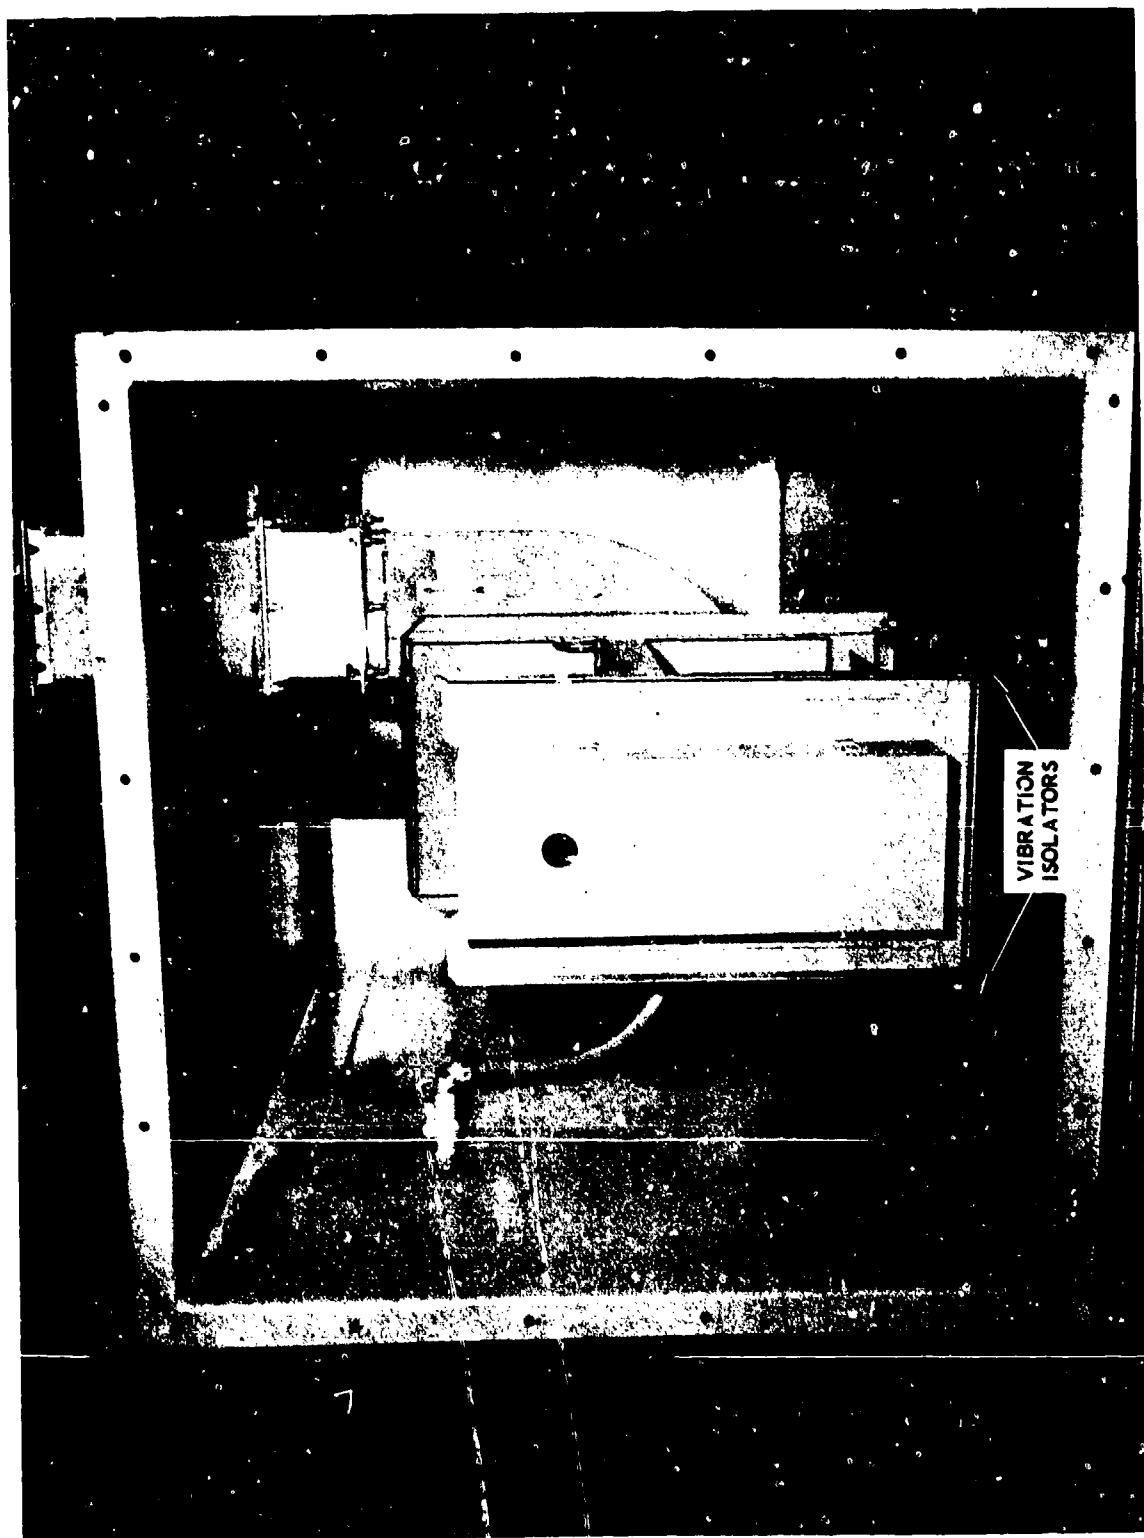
Blower In Type I Housing With Rear Maintenance Panel Removed. Power Cord Is Only Penetration In This Area On Smaller Units (Under 1,000 Cfm)
